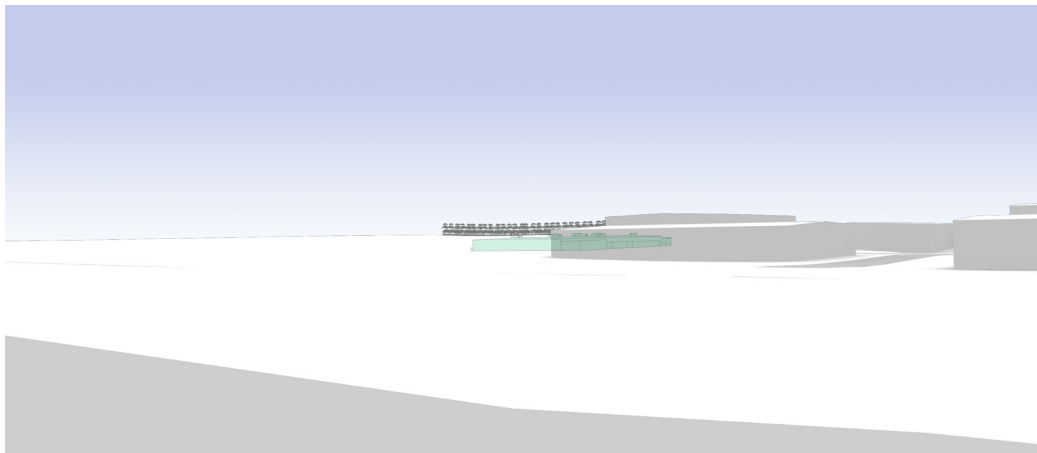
View 01 - Buildings with proposed plant and proposed boundary trees
